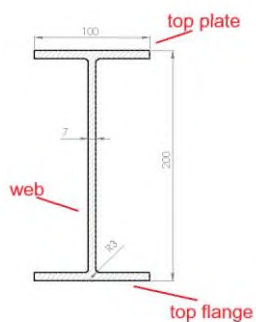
Cross-section and dimensions of the tested overhead crane girder
